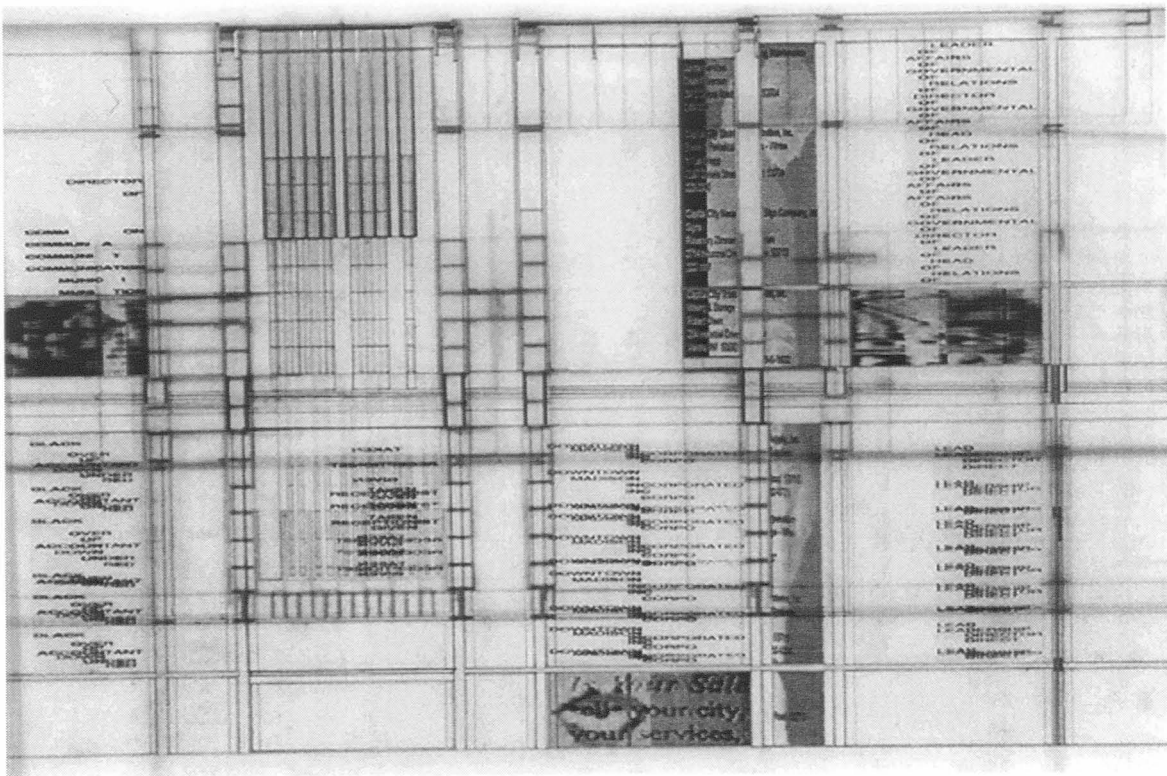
Superimposition- Plan/Plan/Elevation with Text-Screening, Facade Imaging and Slippages Among Storefront and Office Partitioning Systems
